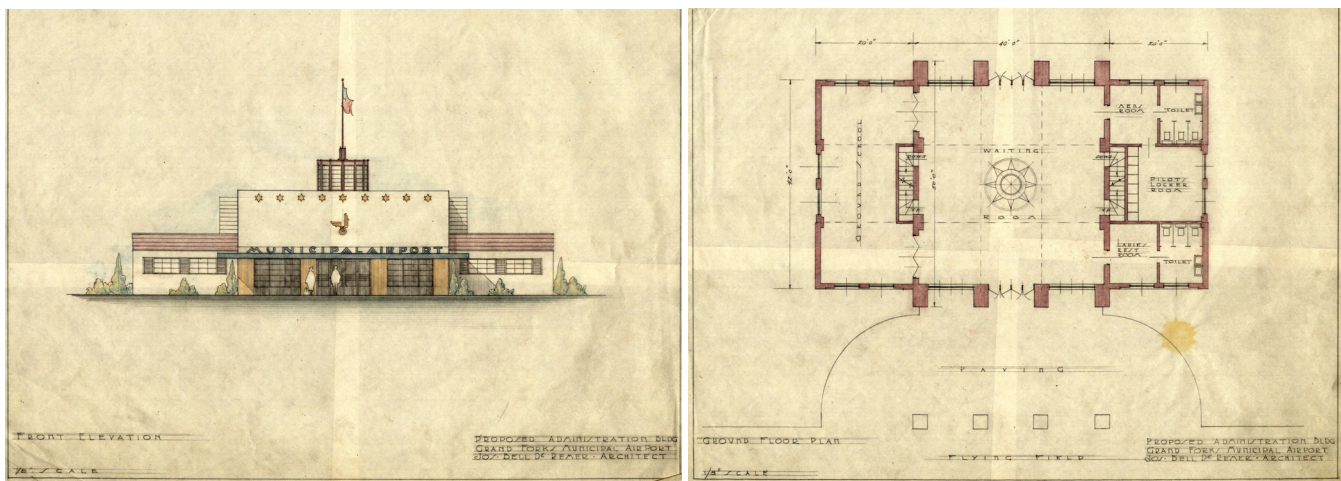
& 31: Joseph Bell De Remer elevation rendering and Ground Floor Plan for “Proposed Administration Building: Grand Forks Municipal Airport,” no date. (Joseph Bell DeRemer Papers)
